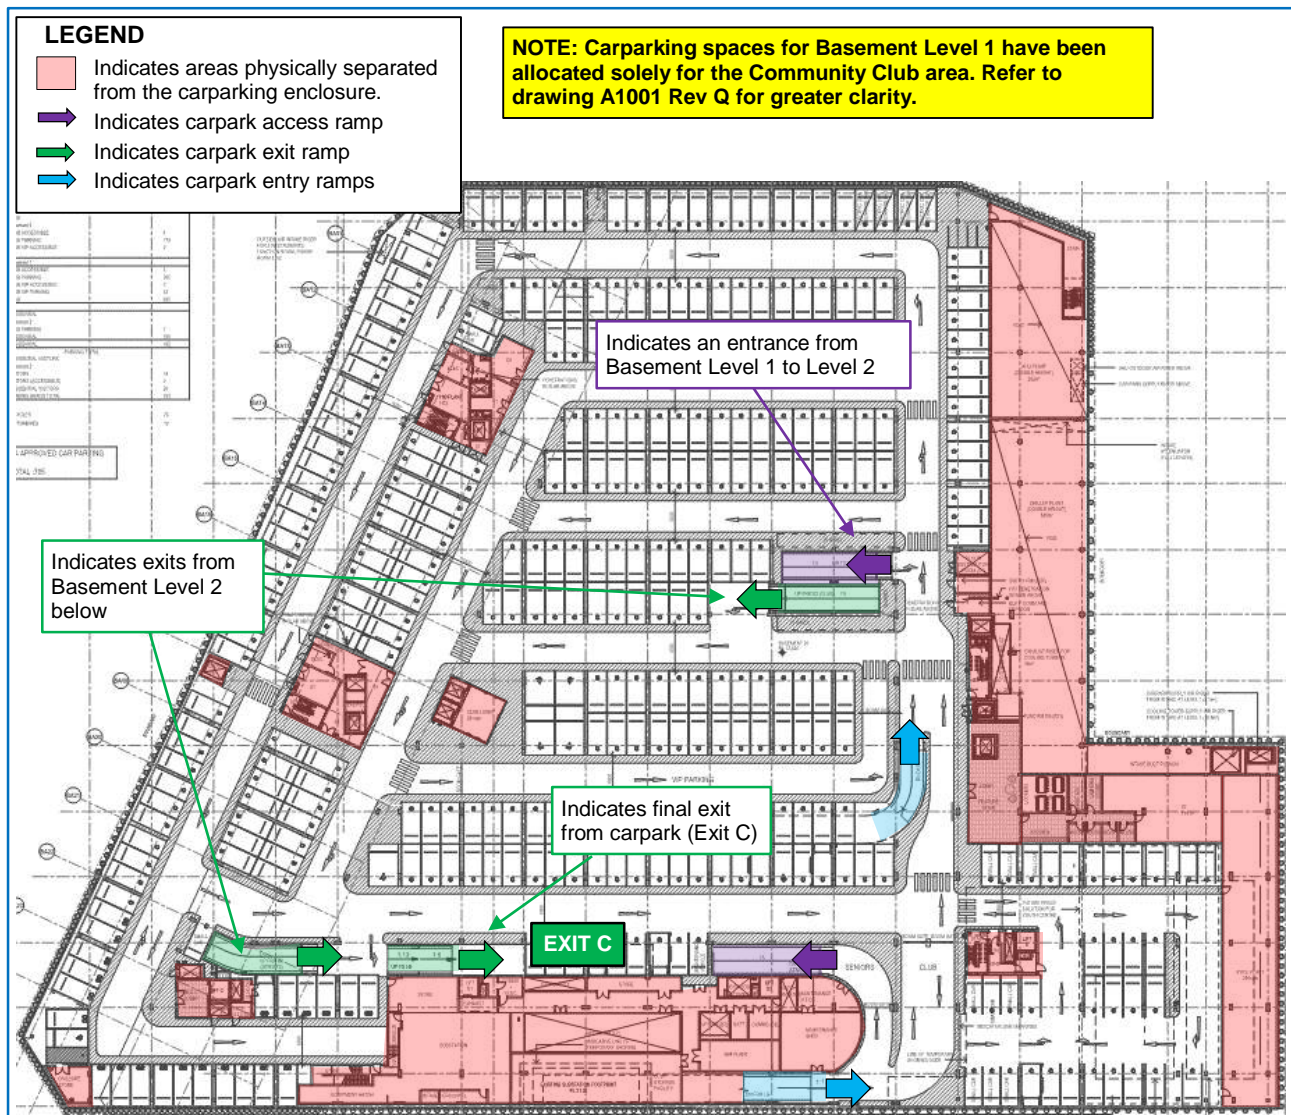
Overall Basement Level 1 Plan – extent of carparking areas
